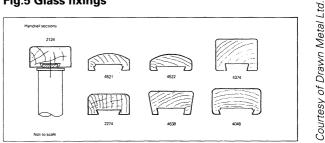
Handrail sections using thin gauge stainless steel drawn onto a timber core
